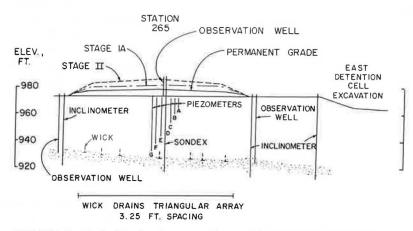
Typical embankment section and instrument locations at Florence Lake, Station 265.
